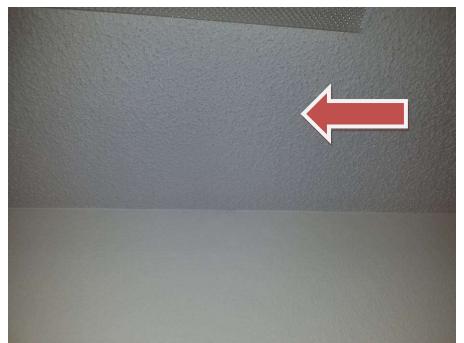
Typical RACM white plaster ceiling finish (popcorn ceiling) on floor 1.
